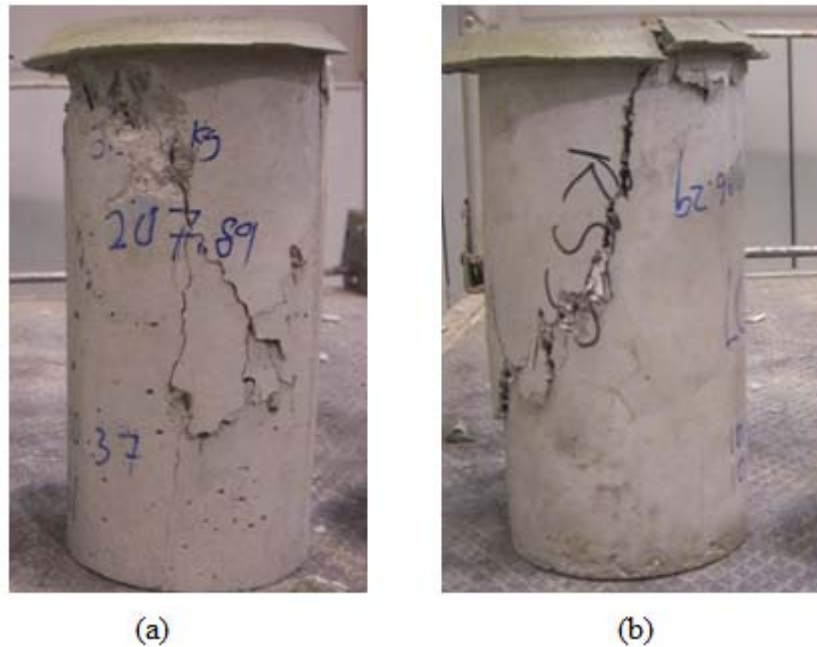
Shear failure of concrete cylinders under unconfined concrete compressive test (a) normal weight concrete, (b) lightweight concrete.
